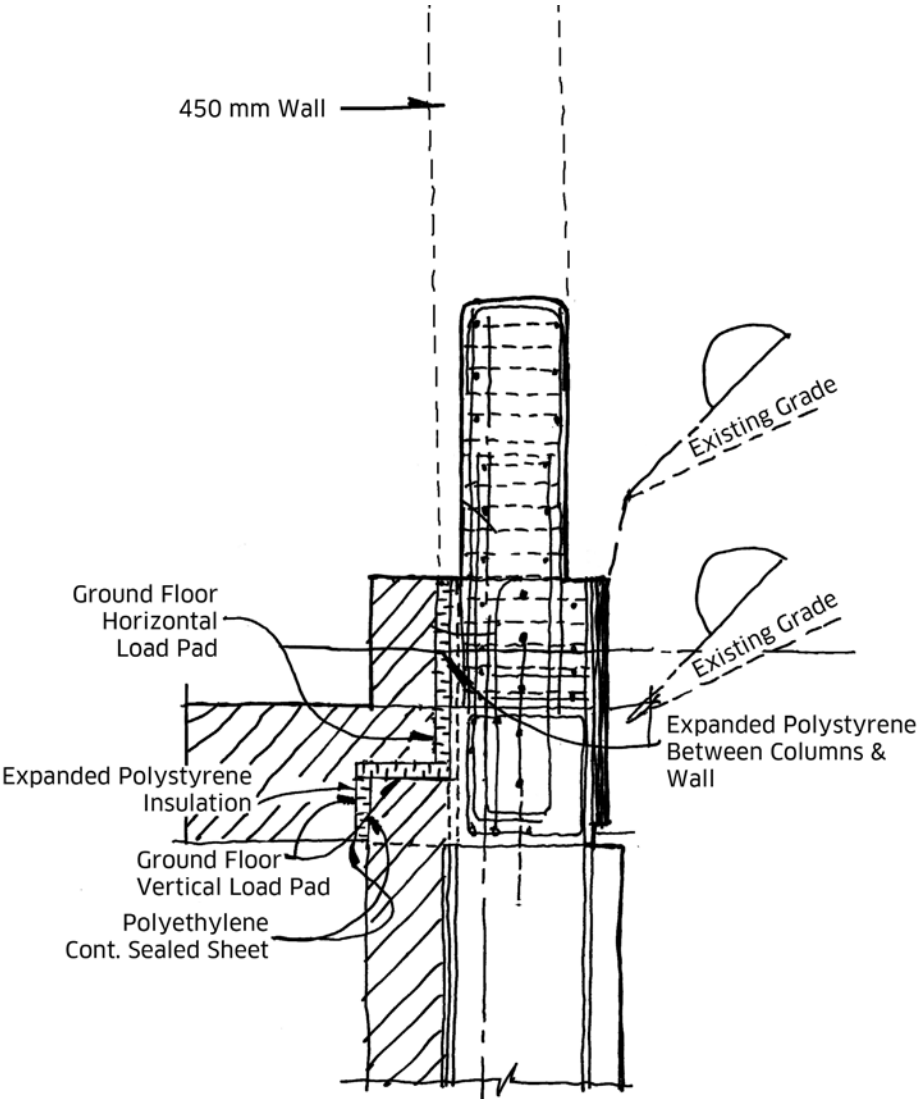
B // DEEP VIBRATION ISOLATION DETAIL, COMBINED WITH CRASH WALL.
